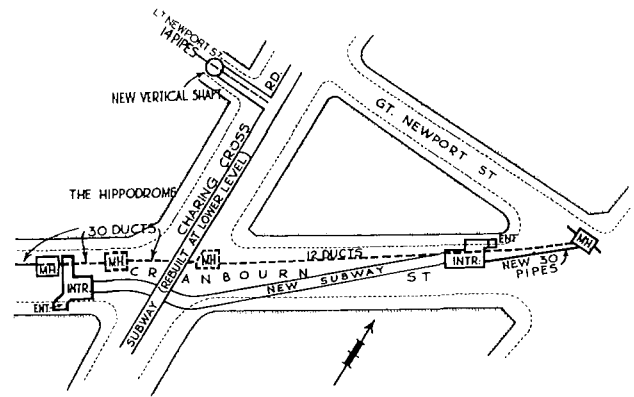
PLAN SHOWING DEPARTMENT'S PLANT, LEICESTER SQUARE STATION.
